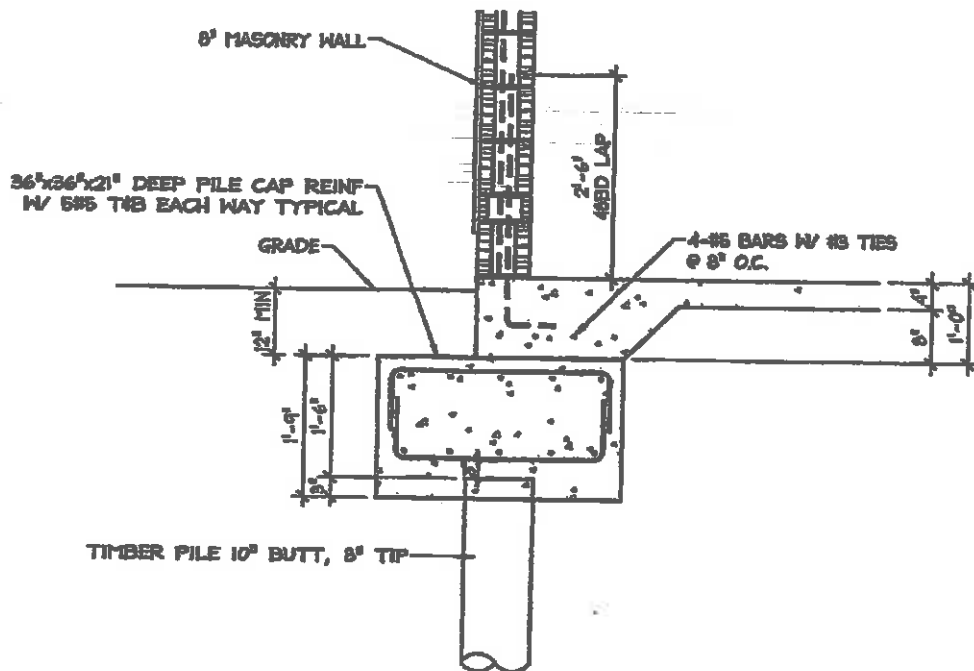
FILE CAP/GRADE BEAM DETAIL
